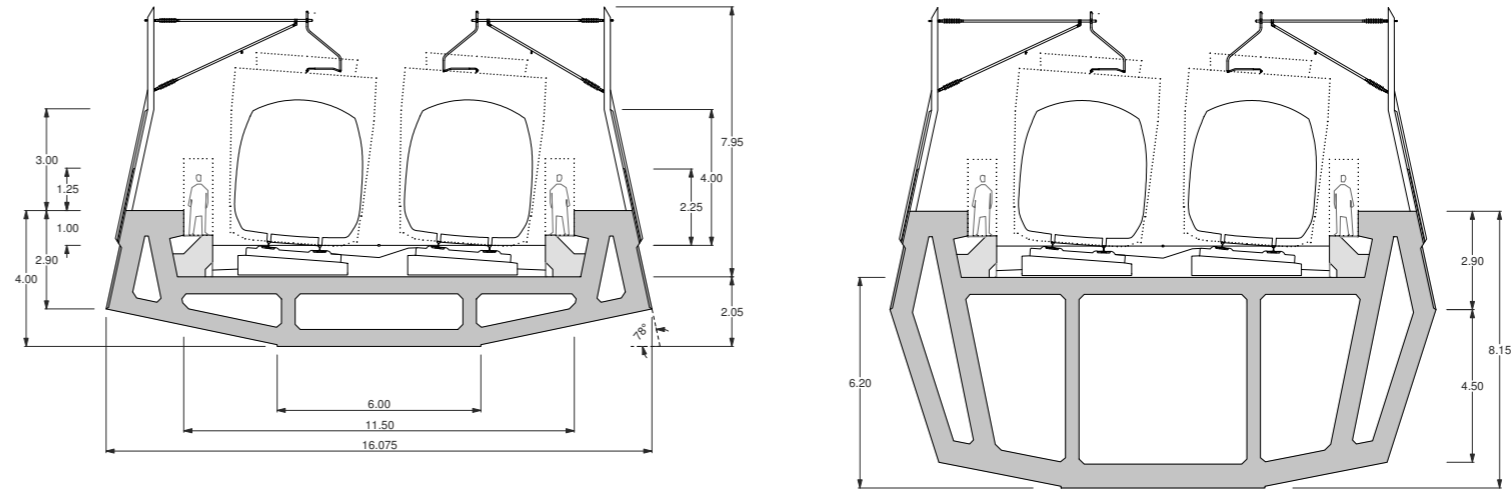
\_ Specimen Design - Typical cross sections (A) and (B)
